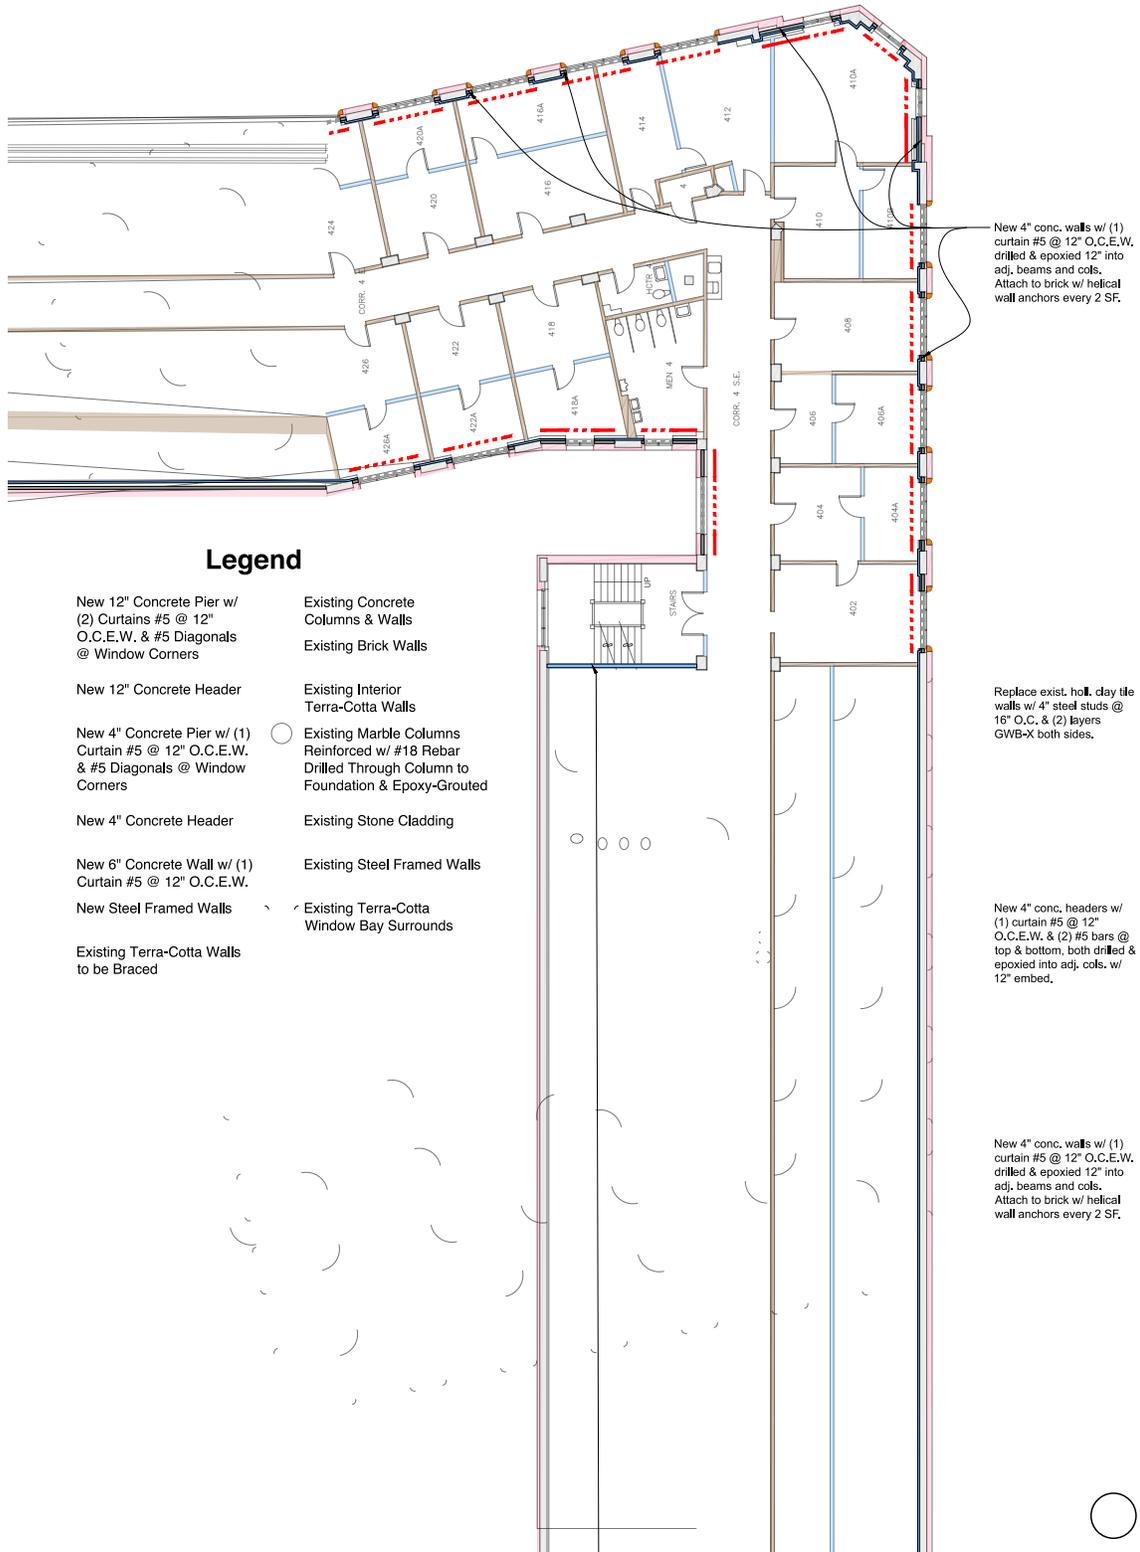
(7): Structural Reinforcing of Building Frame - Floor Level 4
